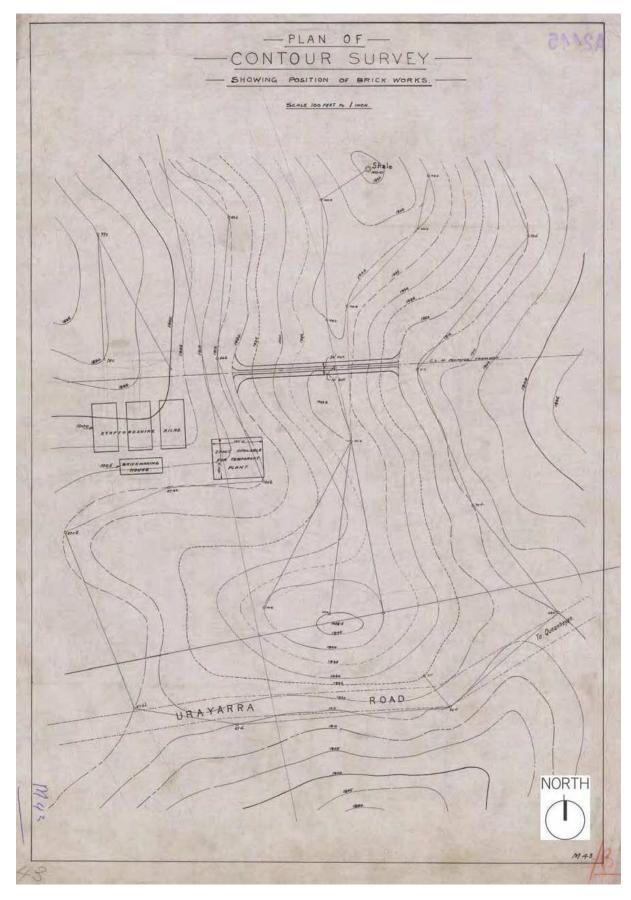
Contour plan with the layout of the Brickworks as proposed in c1911, showing three Staffordshire kilns and the location of the brick making plant. (Source: National Archives of Australia)
